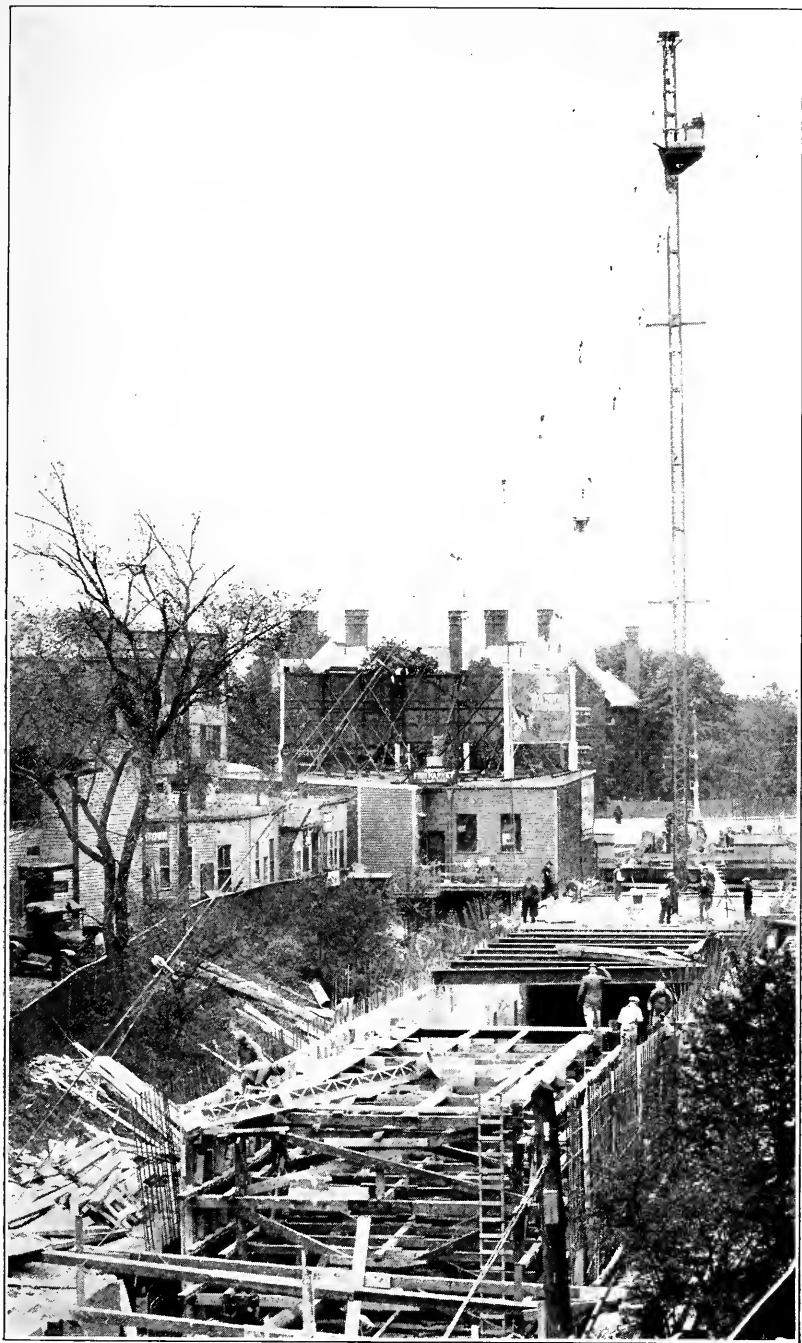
PLATE XI.—CONSTRUCTION, SECTION 3, JUST SOUTH OF
